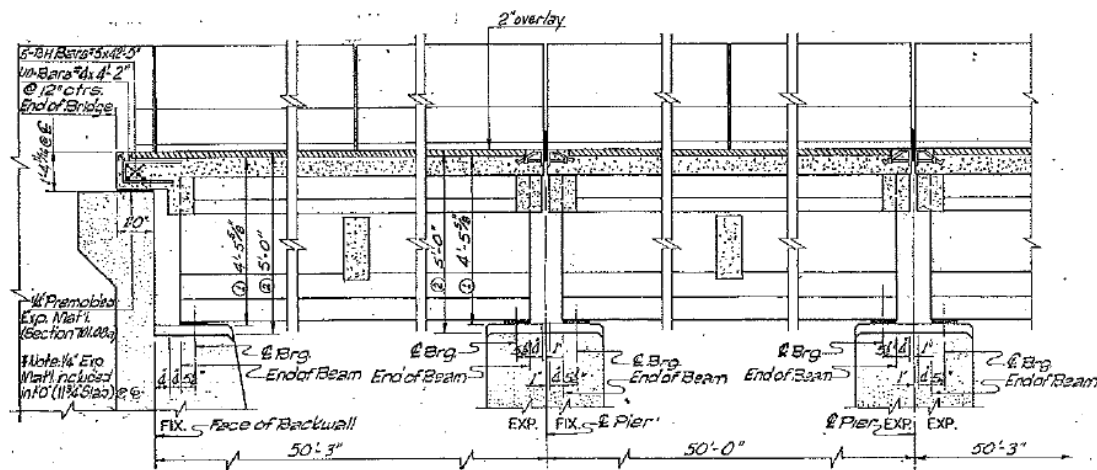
Superstructure longitudinal section. Taken from FAS Project No. R.S. 1910(103) plans.
